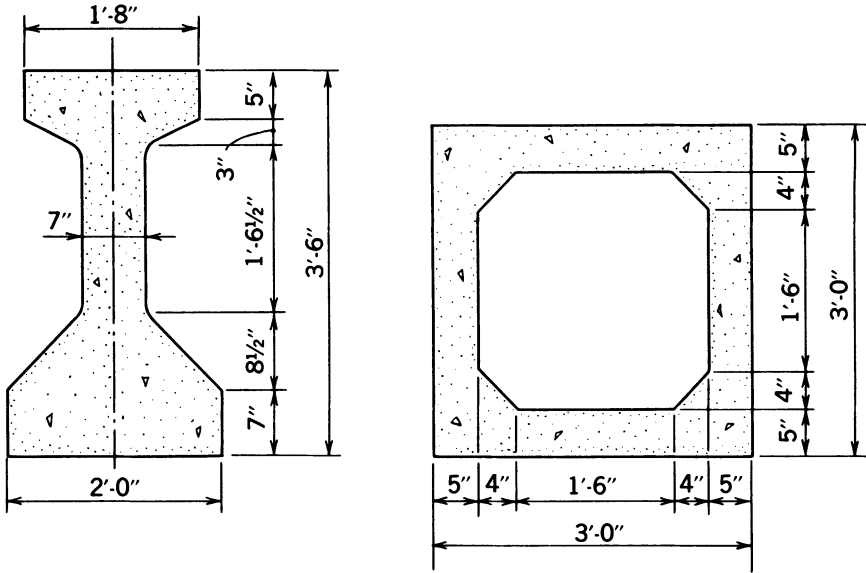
Sections of precast prestressed-concrete beams commonly used in bridges of moderate length.
